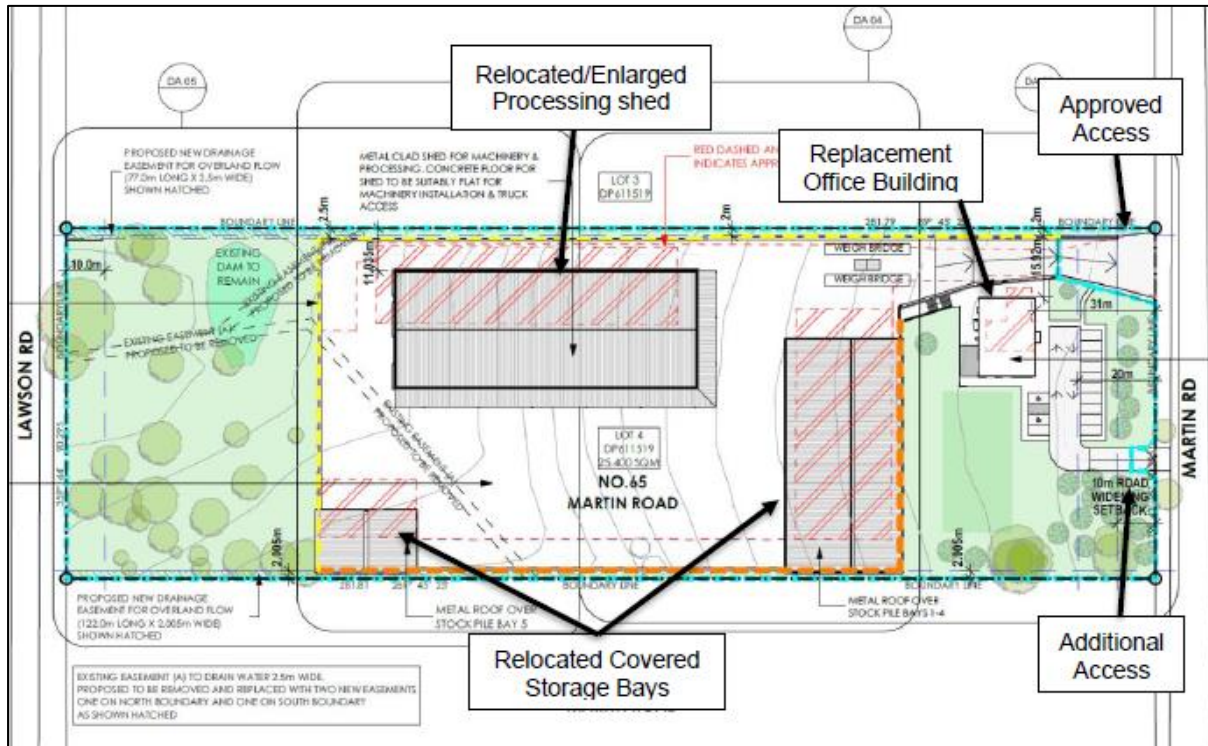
Site Plan (Approved modification DA-263/2018/A)
